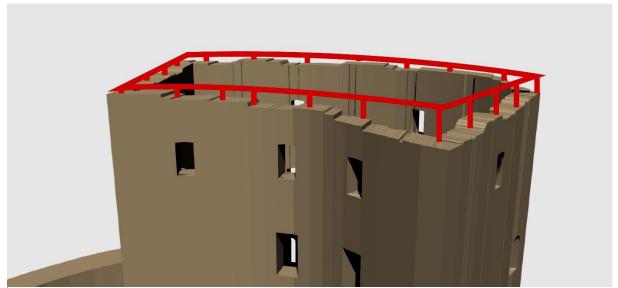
Sketch steel contour frame on top of the wall. Source: own ill.
